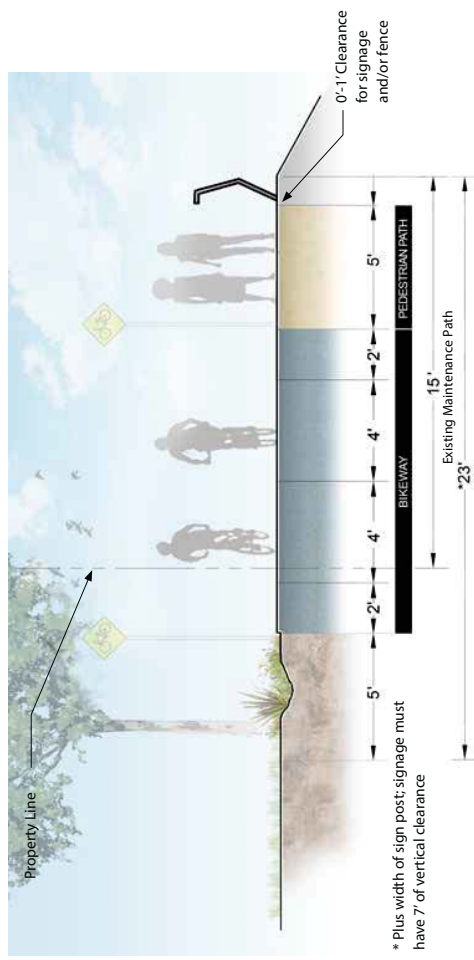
White Oak Avenue to Metro Orange Line Busway - Typical Cross Section
